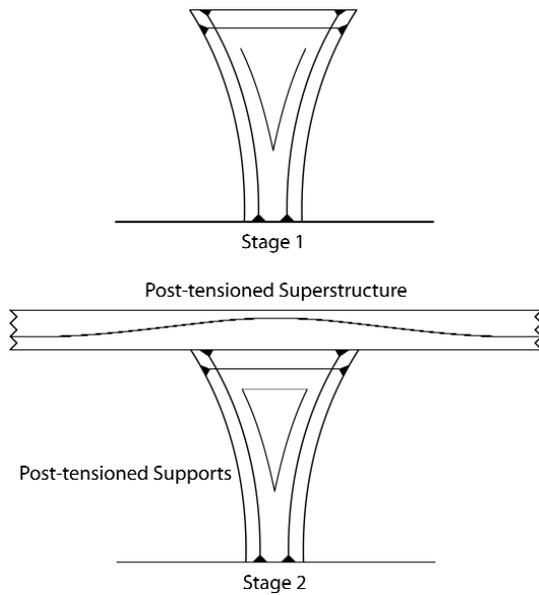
Bridge-like Structure Post-tensioned in two Stages
